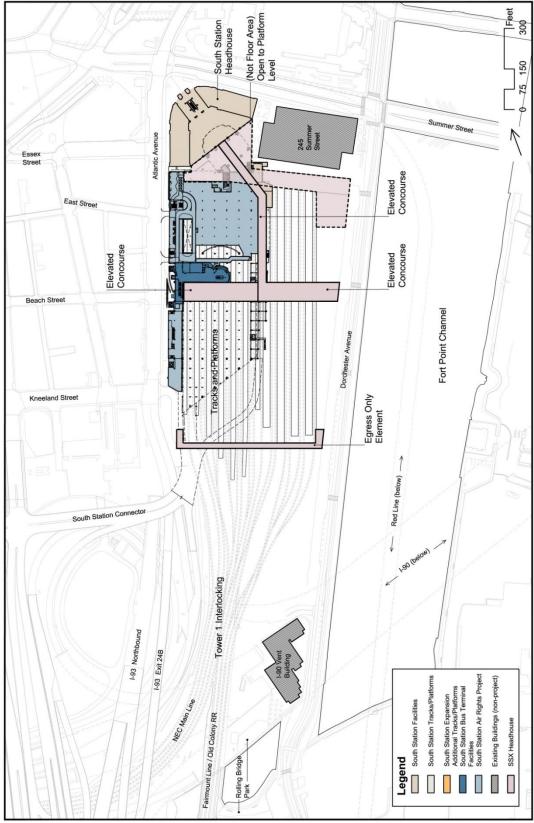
South Station Site – Proposed Elevated Concourse Level
